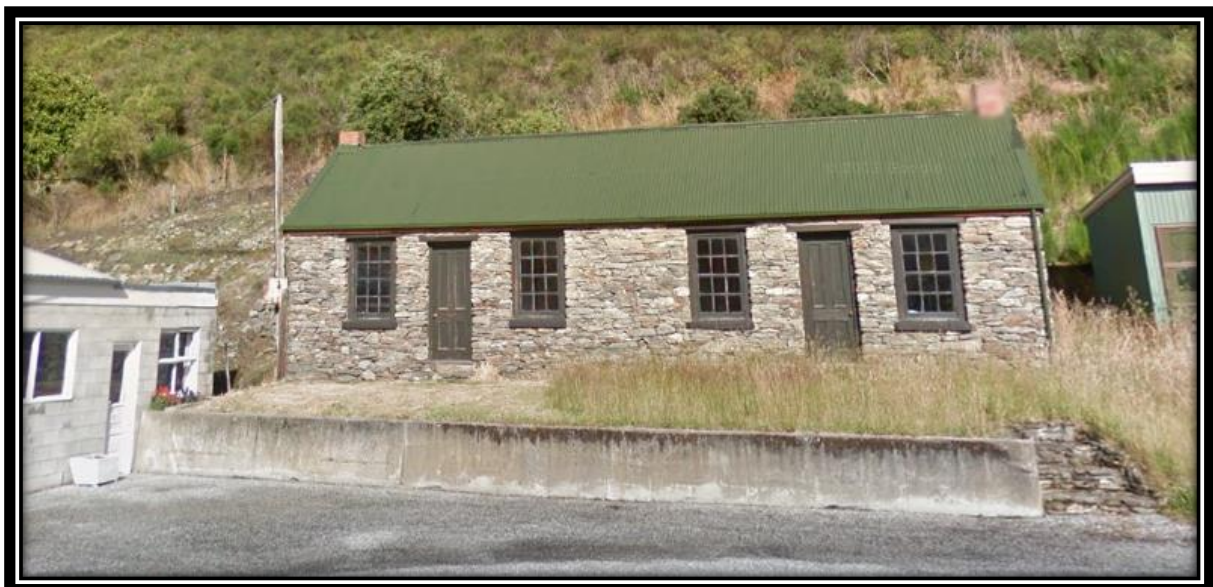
View of Retaining Wall and Stone Steps from the Formed Carriageway.
